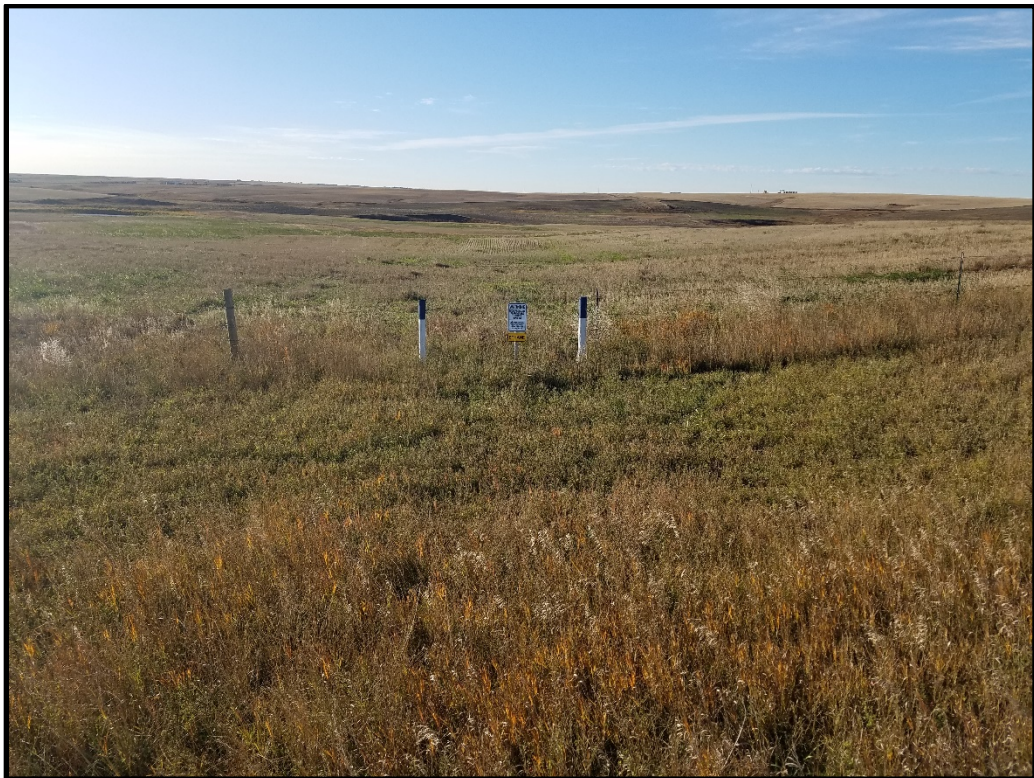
View looking south at the pipeline corridor in Section 10, T156, R103W. Photo taken looking south from 65th Street.
